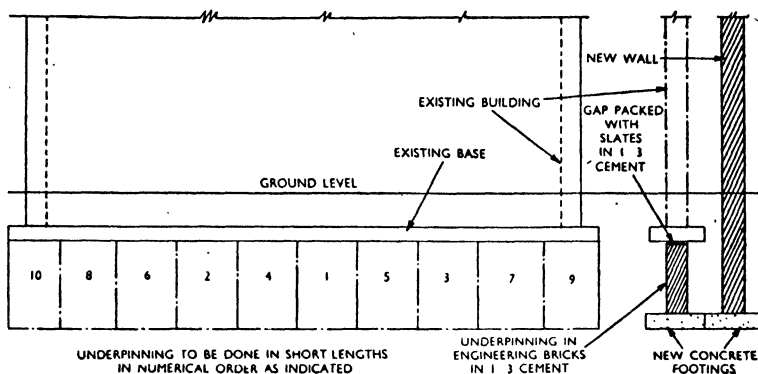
Method of underpinning a wall in order to lower its foundations, and also, if required, to build a new wall alongside the old wall.
